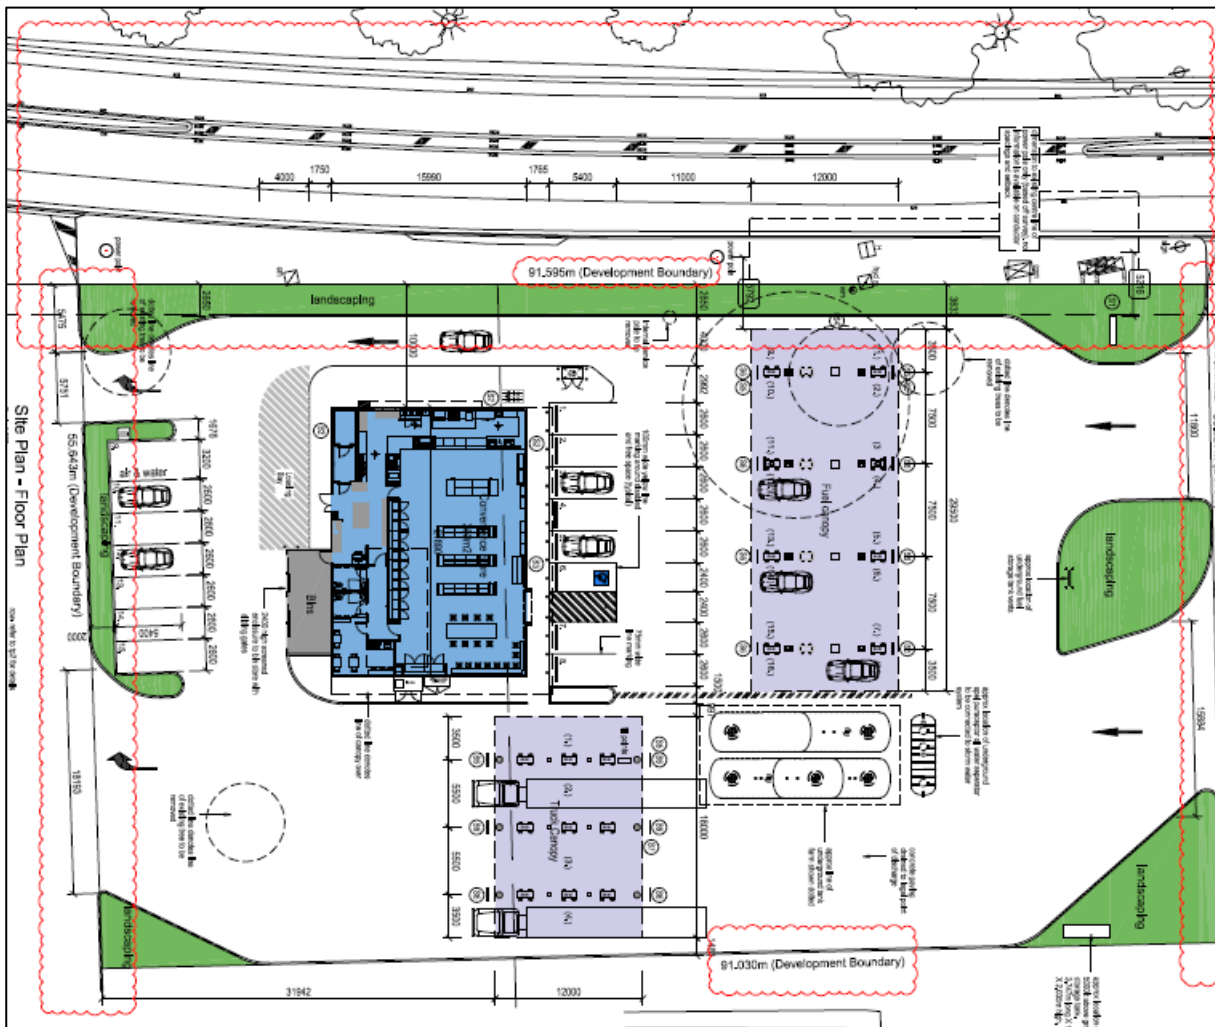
PROPOSED SITE PLAN (MCL BUILDING DESIGN)
